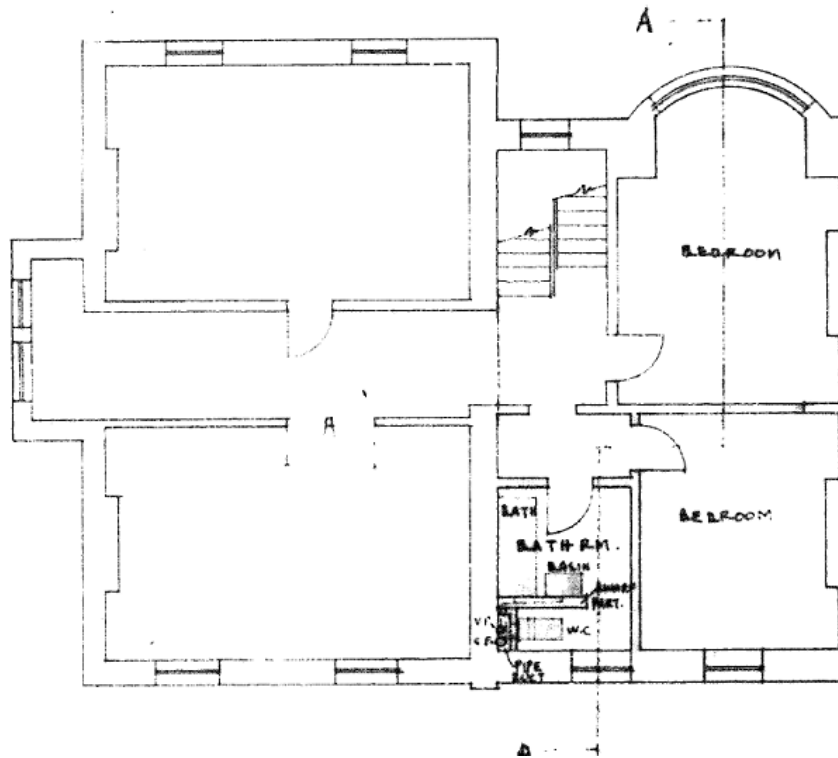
The first floor plan in 1945 before subdivision (Camden drainage records)
